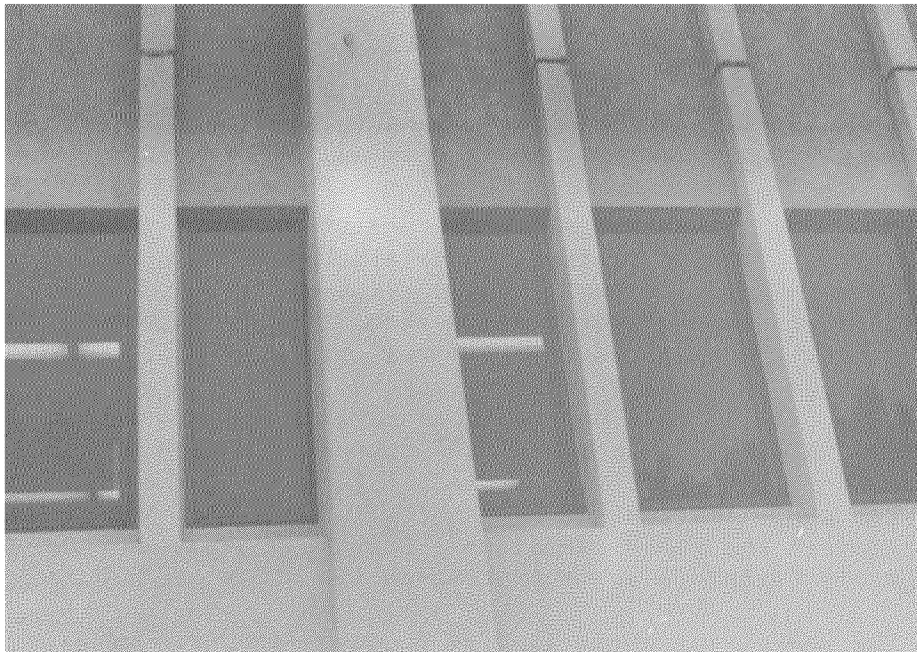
Shear crack forming an X pattern in column in second story of Santa Barbara County Administration Building.
